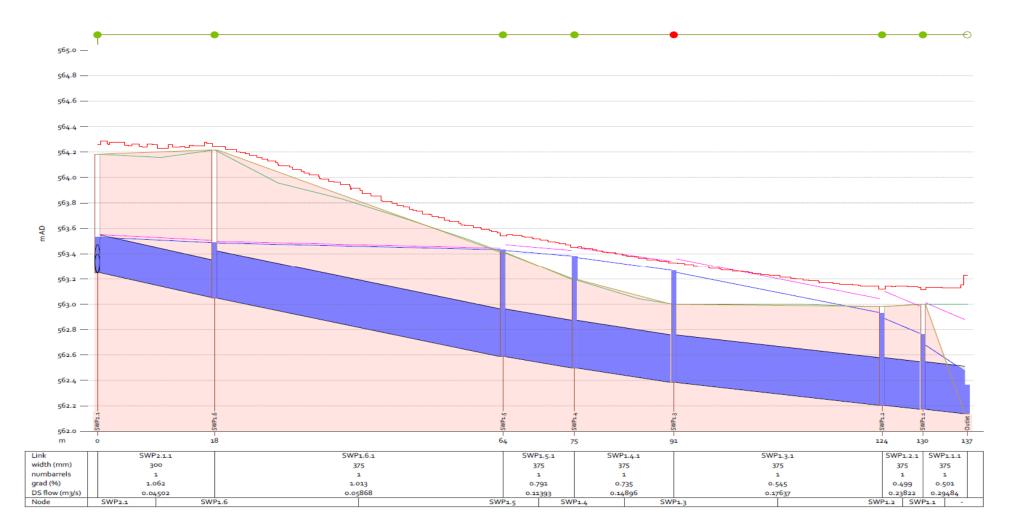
1% AEP water profile for stormwater drainage long section between pits SWP2.1 to the outlet in Yass Street
